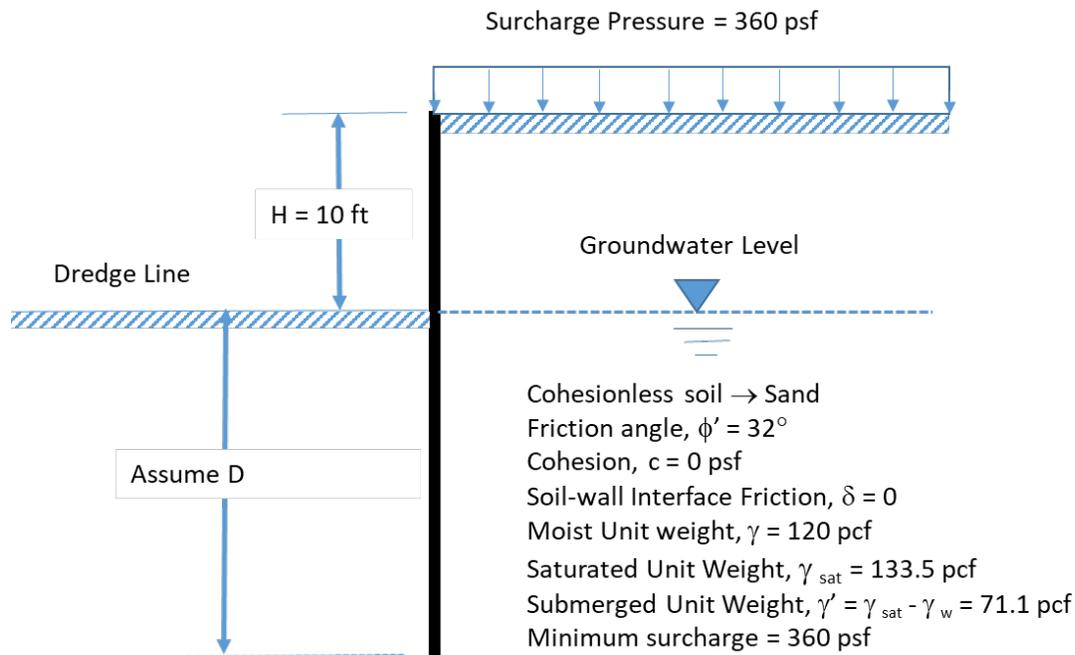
Case 1 Cantilever wall in cohesionless soil with level backfill.
